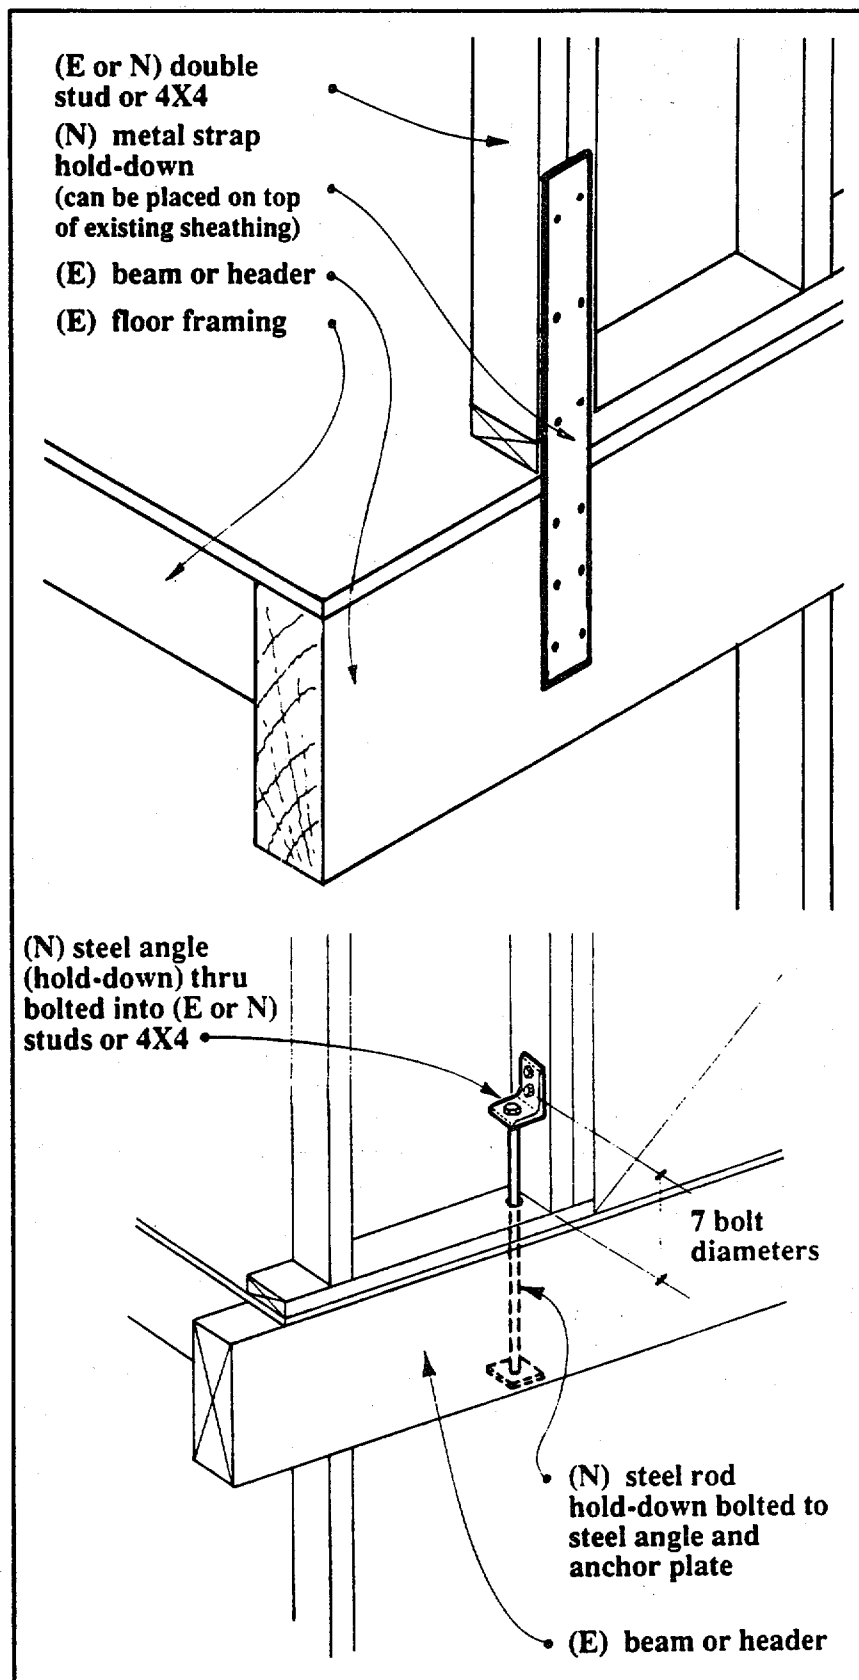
Strengthening shear wall uplift capacity at a discontinuity.
